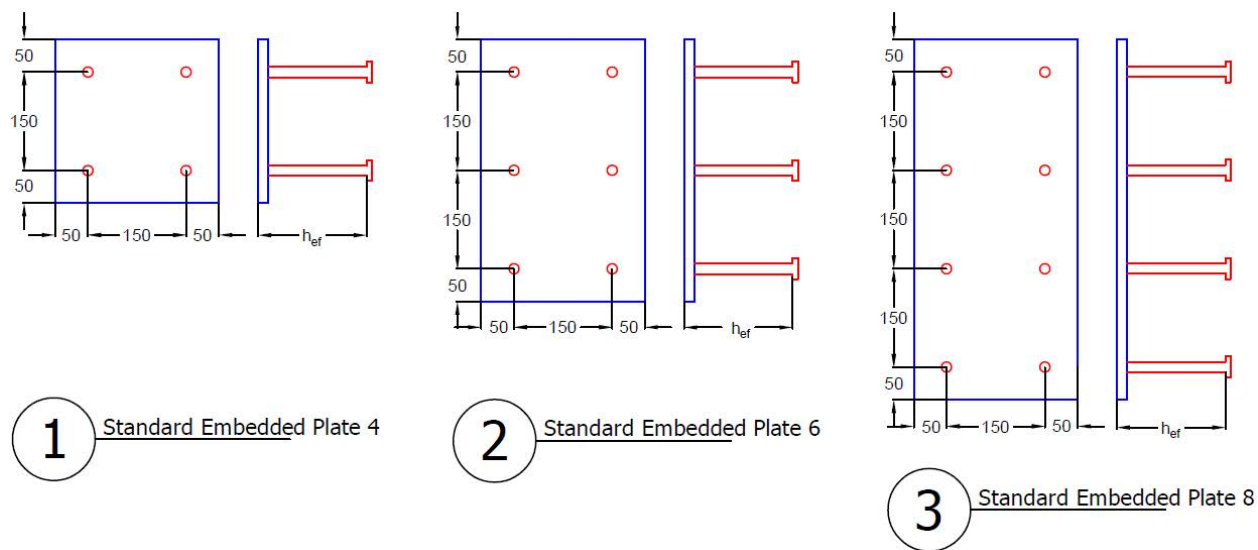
Proposed standard embedded plates (dimensions in mm)
